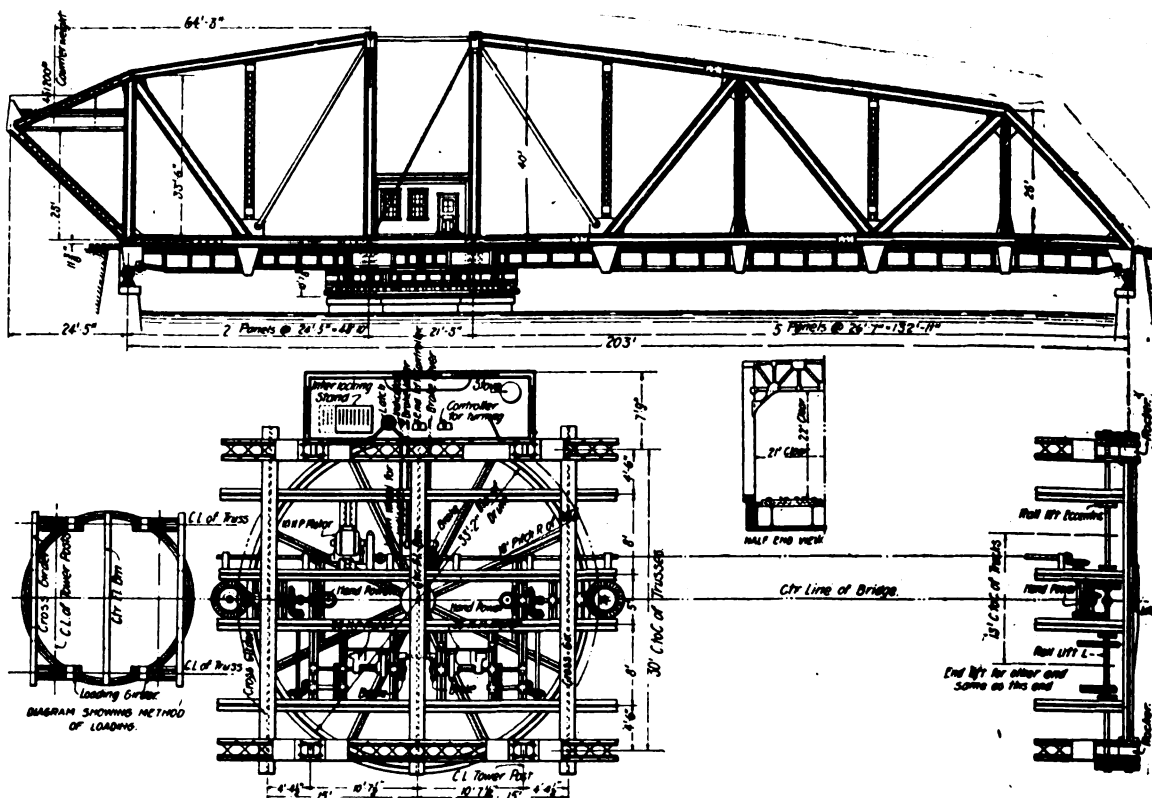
ELEVATION OF COUNTERBALANCED SWING BRIDGE AT MILWAUKEE.
